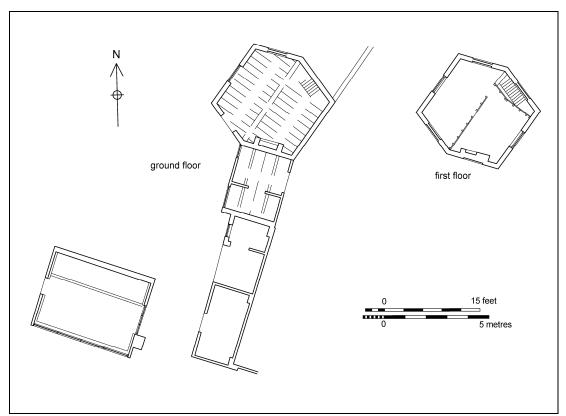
Floor plans of garden buildings, derived from architects drawings.
